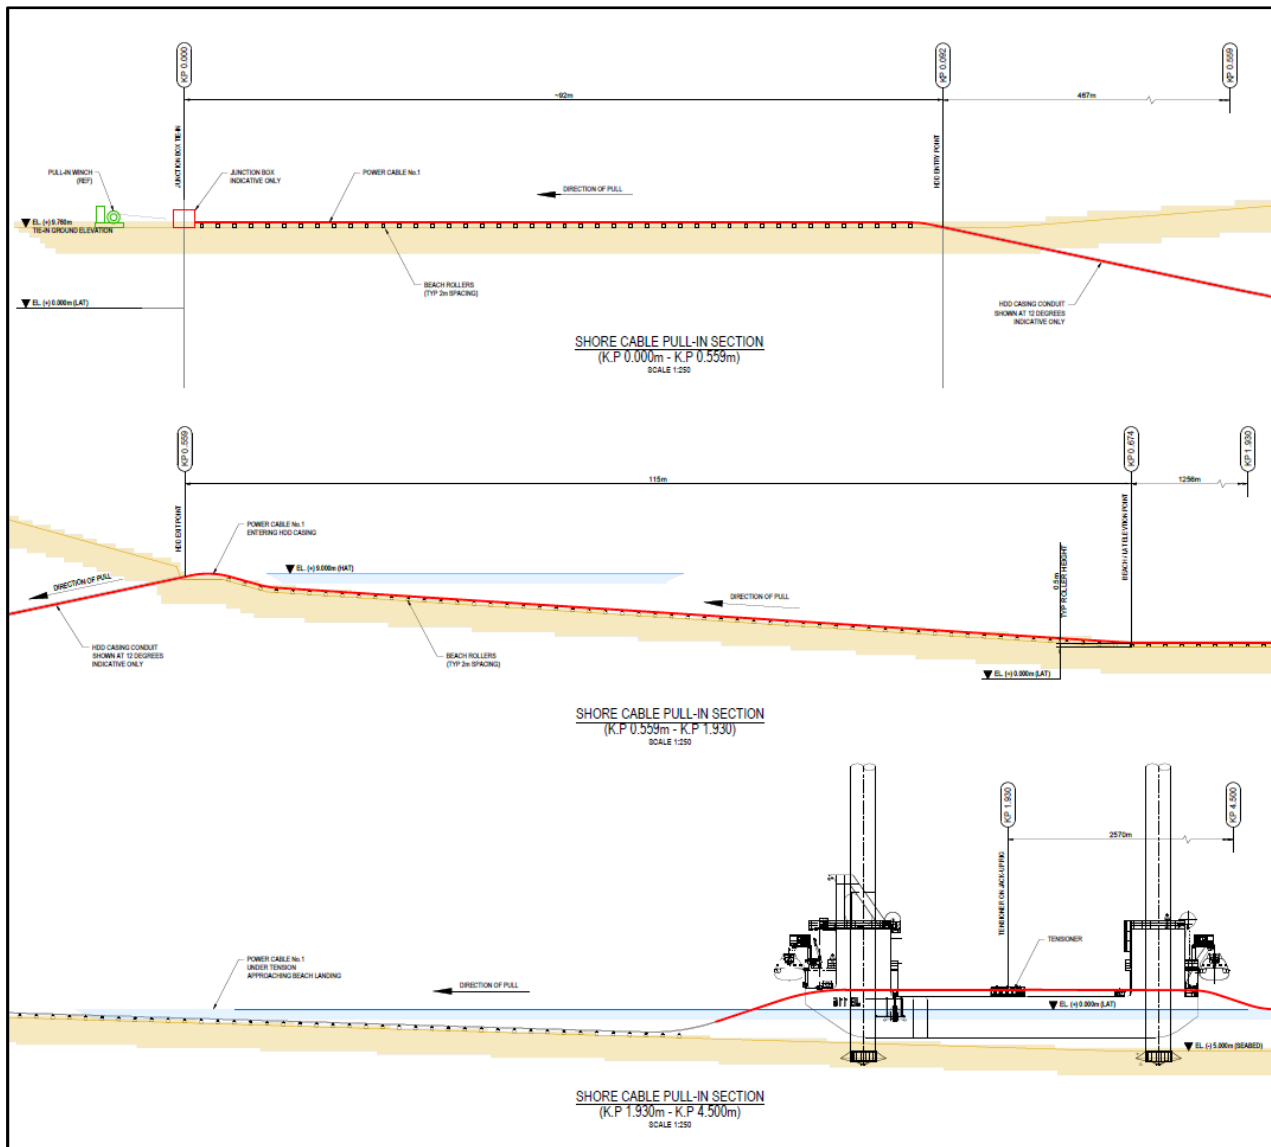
Cross Sections Of Cable Installation Through Dunes And Across Talacre Beach
